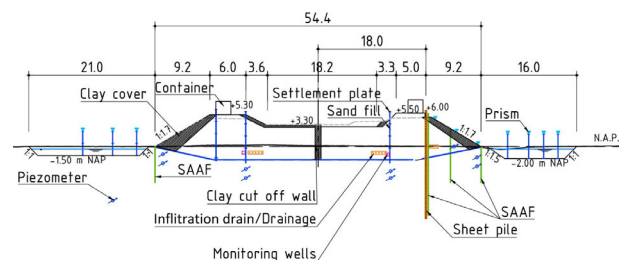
Cross section of ground dike (left) and sheet pile dike (right) with monitoring instrumentation.
